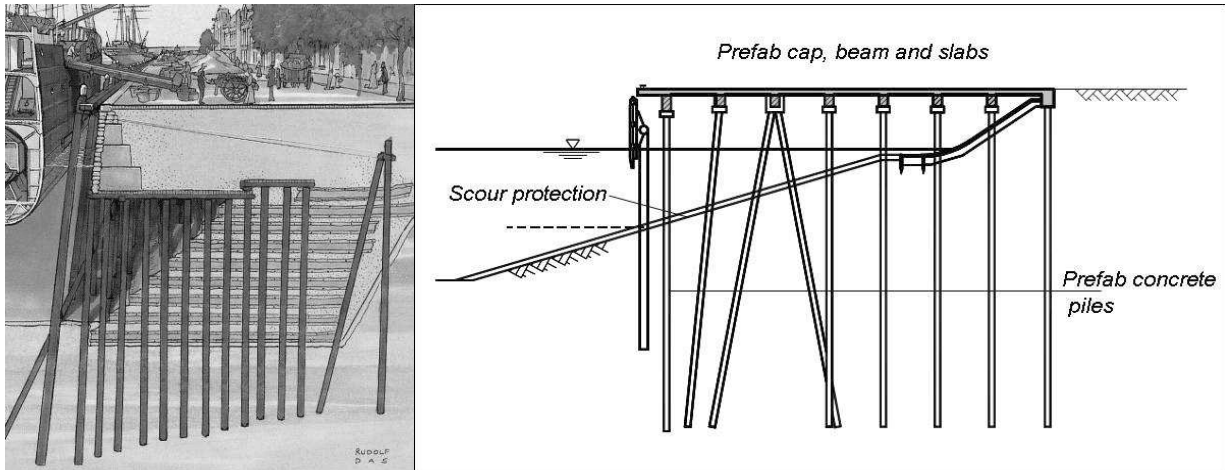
Composite soil retaining structures; Gravity wall and piles (left), platform, piles and slope (right)
